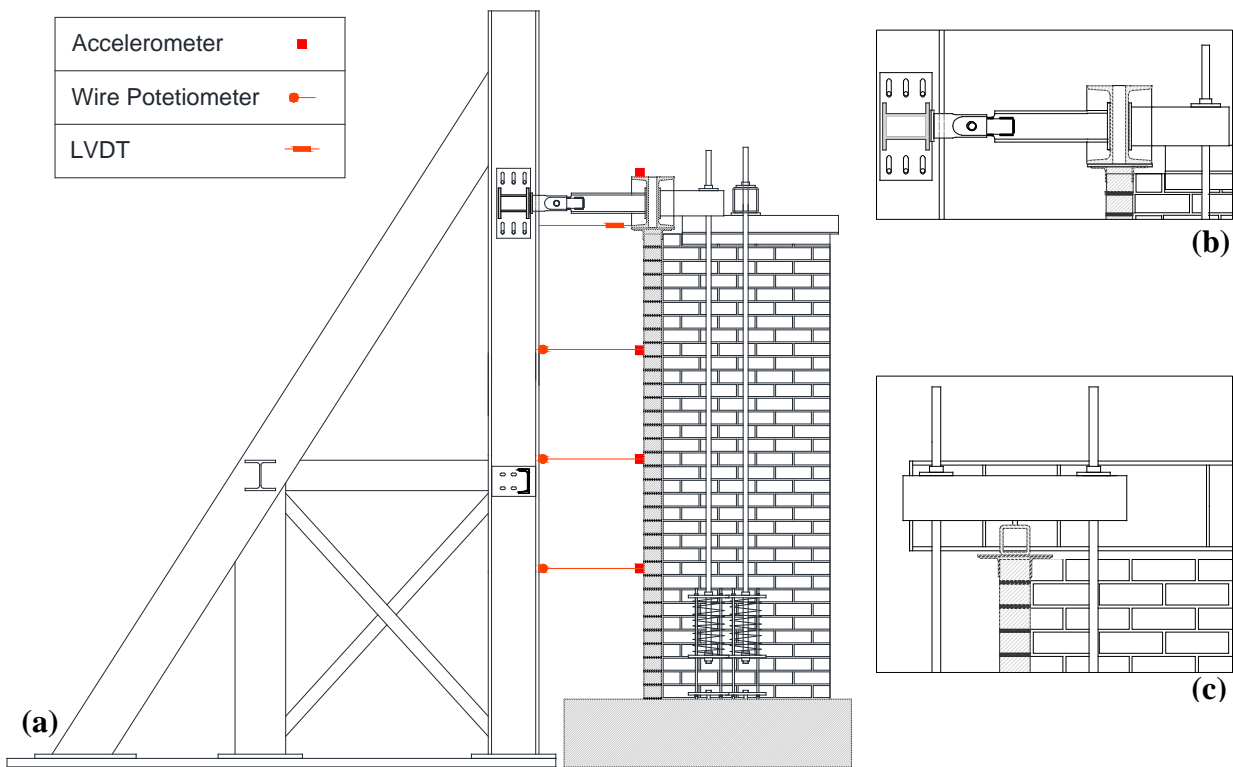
Geometry of the test set-up: general view (a), connection between top beam and rigid frame (b) and return wall loading system (c).
